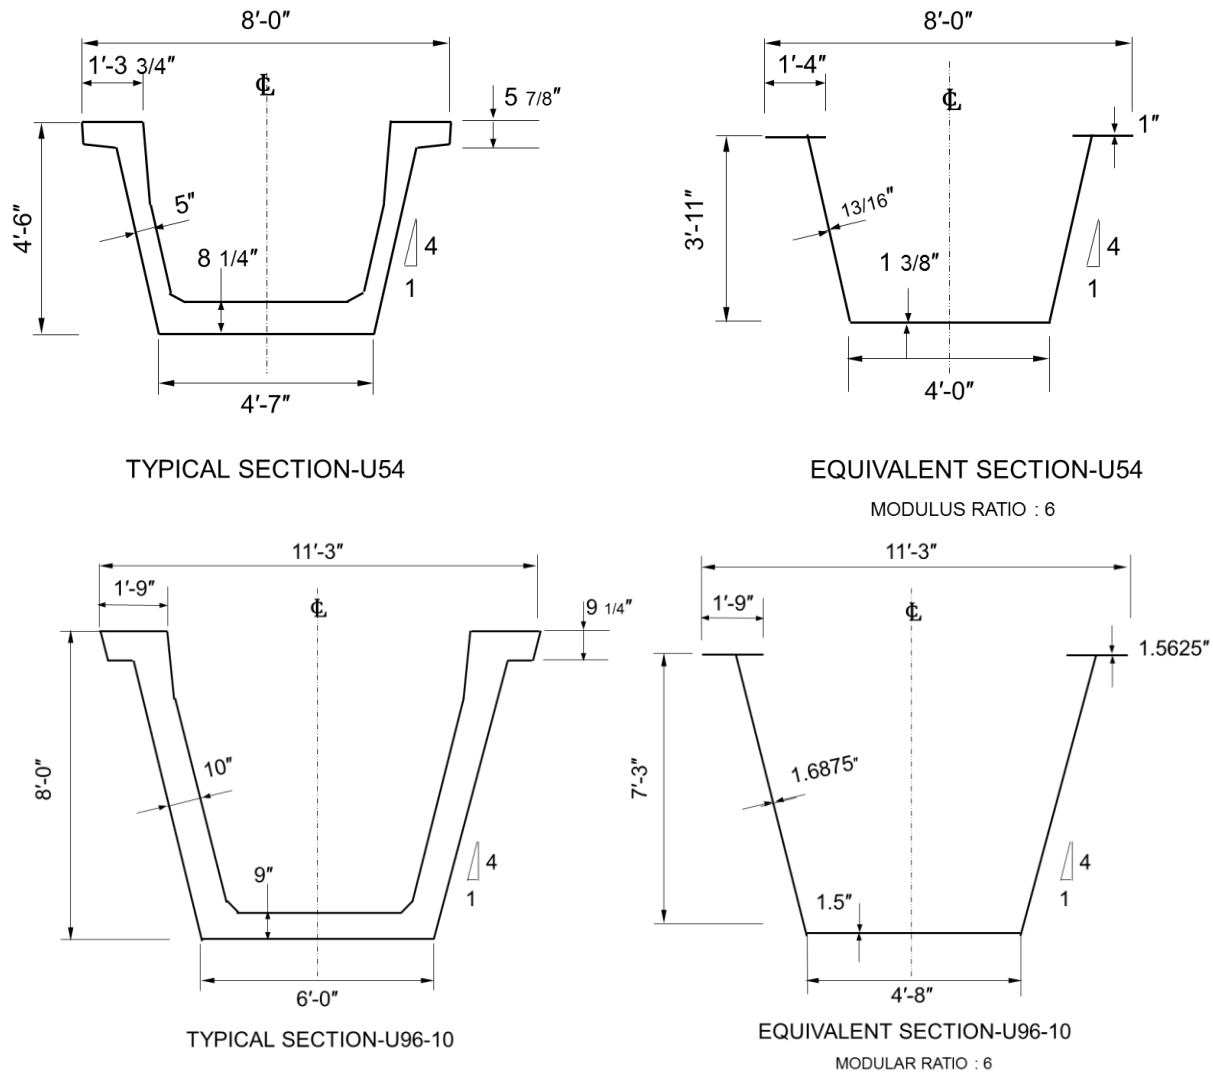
U96 and U54 Beam and Equivalent Steel Section dimensions
